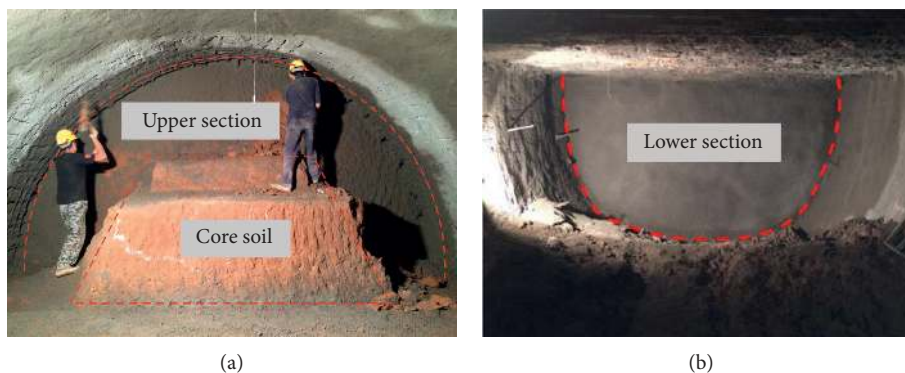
Bench excavation method: (a) upper section, (b) lower section.
